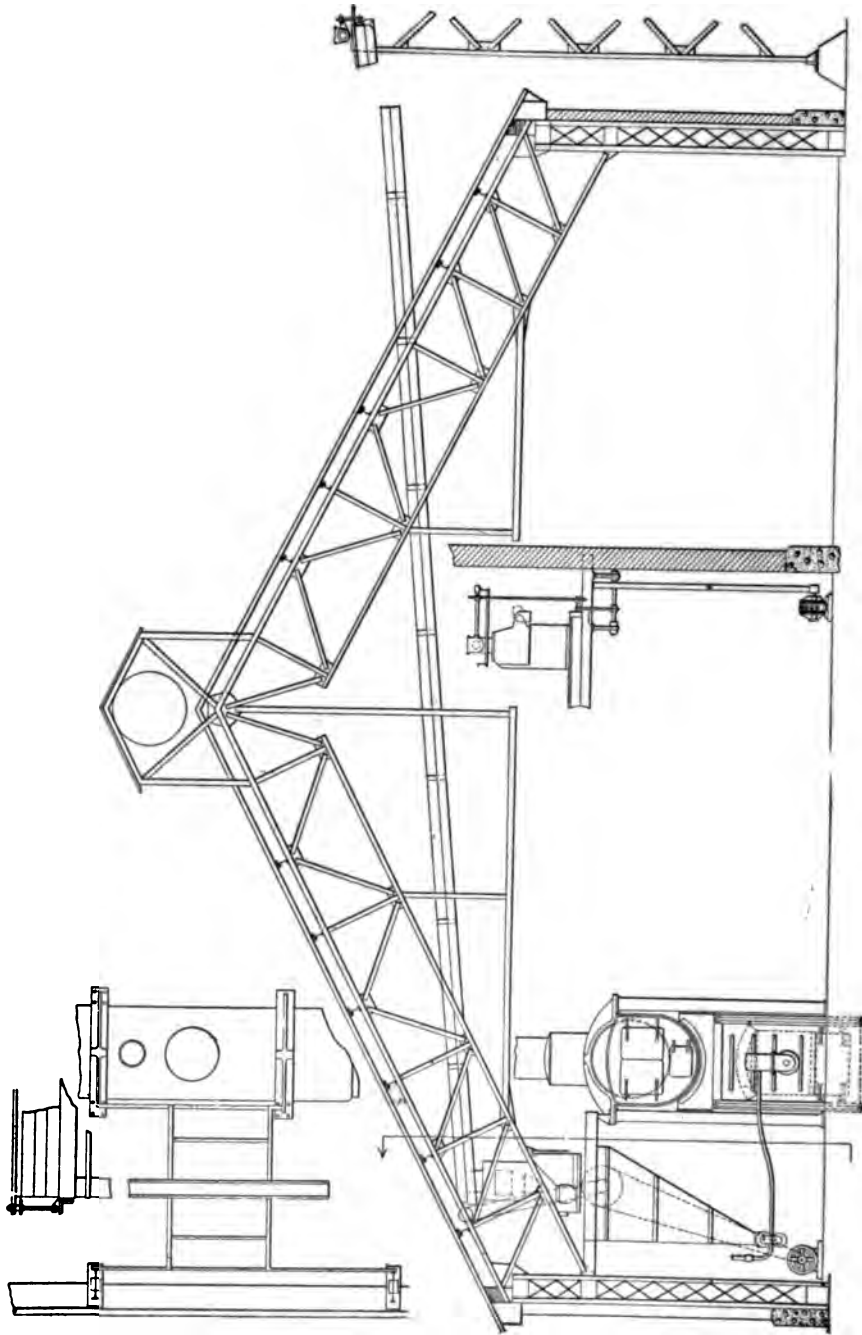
Cross-Section of Hammer Mill Showing Location of Cross Conveyor, Scale, Powdered Coal Hopper 114
